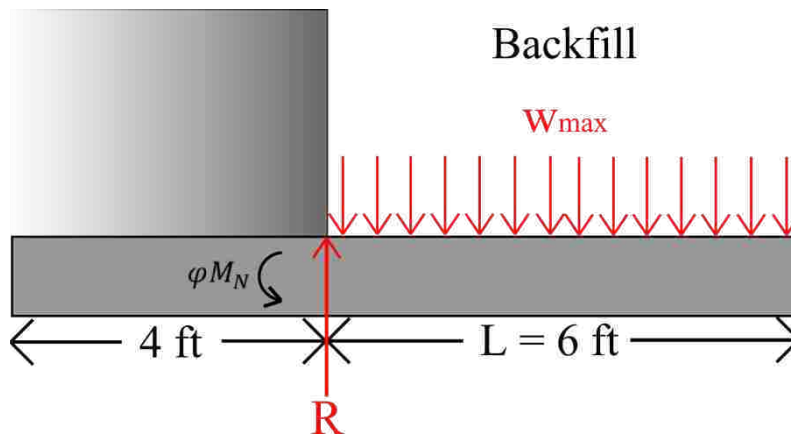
Uniform distributed load was used to approximate pullout force demand (R) at wingwall connection to pile cap.
